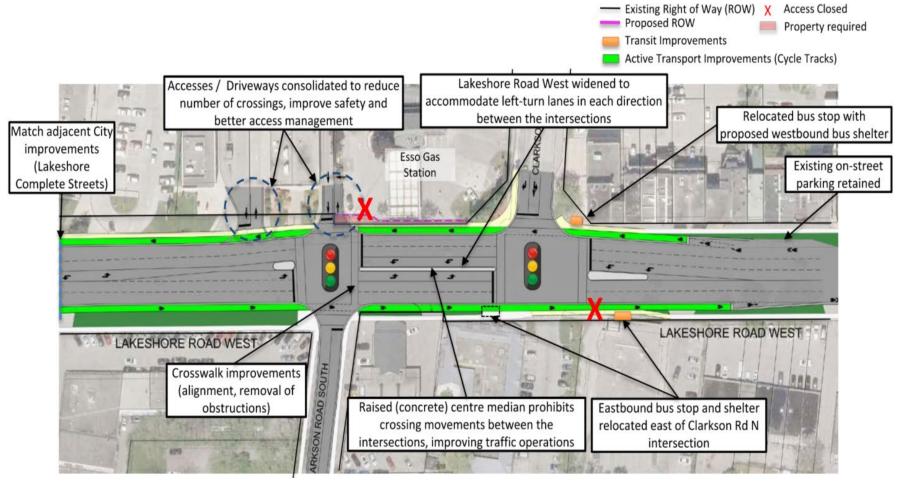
Recommended Plan - Interim Preferred Solution - Overview
